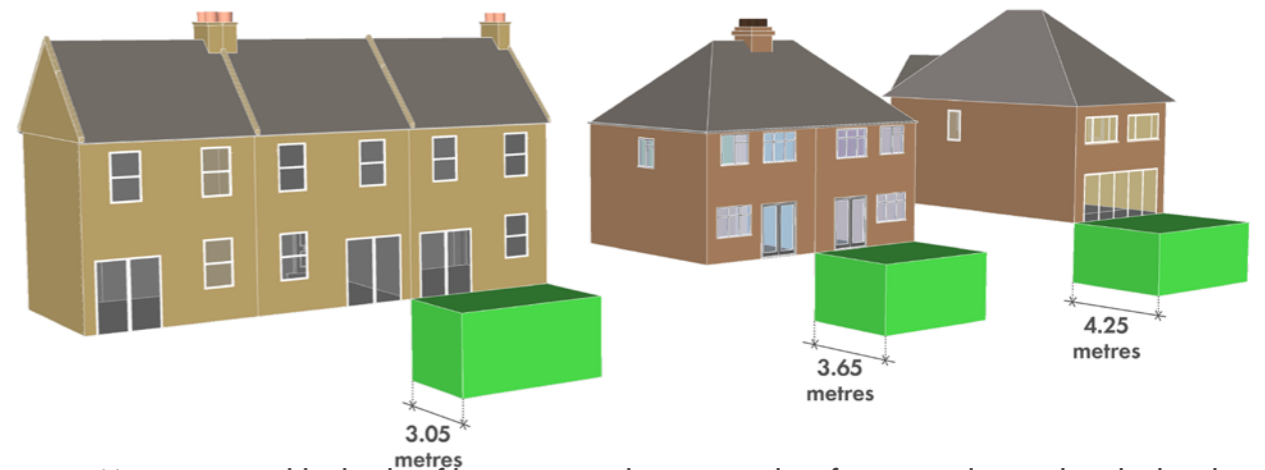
Maximum possible depths of basements under rear gardens for terraced, semi-detached and detached houses
